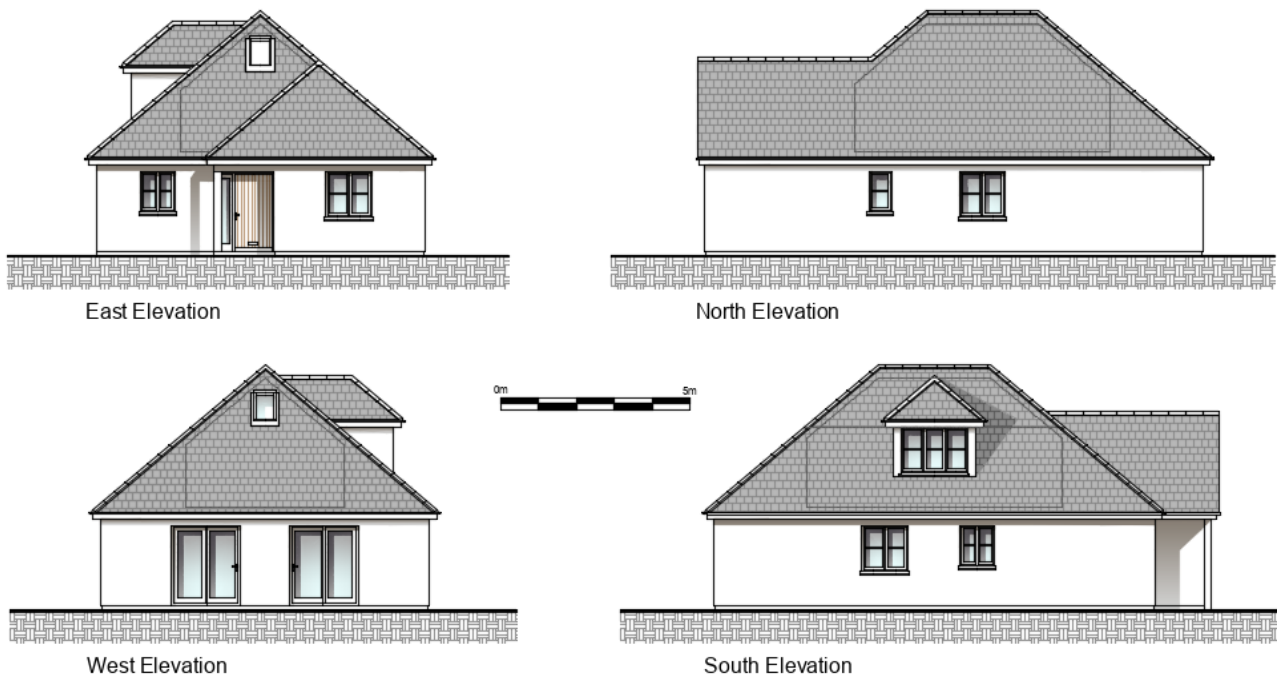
Extracts from Submitted Proposed Plans and Elevations
